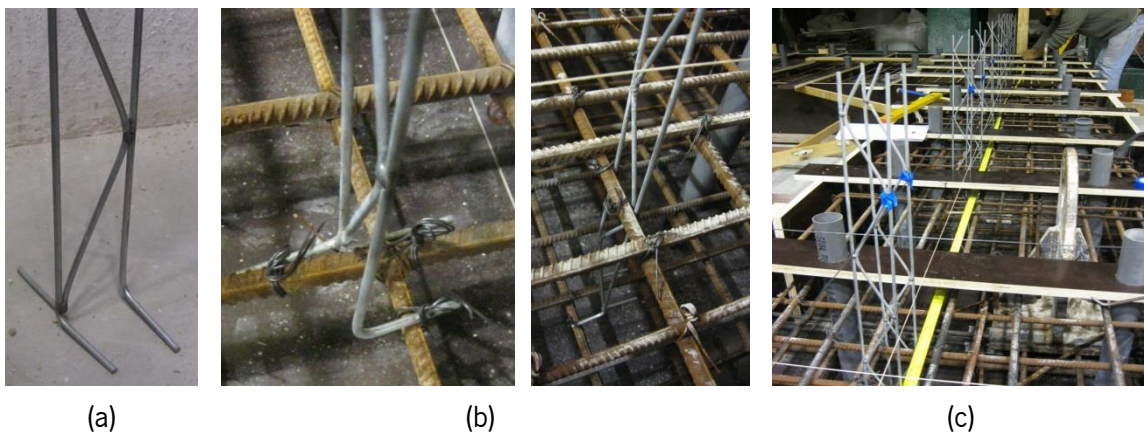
Vertical truss type reinforcement for masonry: (a) bent of anchorage, (b) anchorage to foundation's reinforcement and (c) final position on foundation before casting
